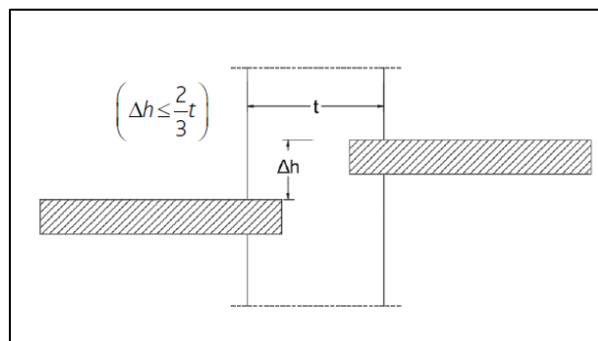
Constructive requirement between buildings to apply the rapid assessments (adapted from (Bernardo et al., 2021))
